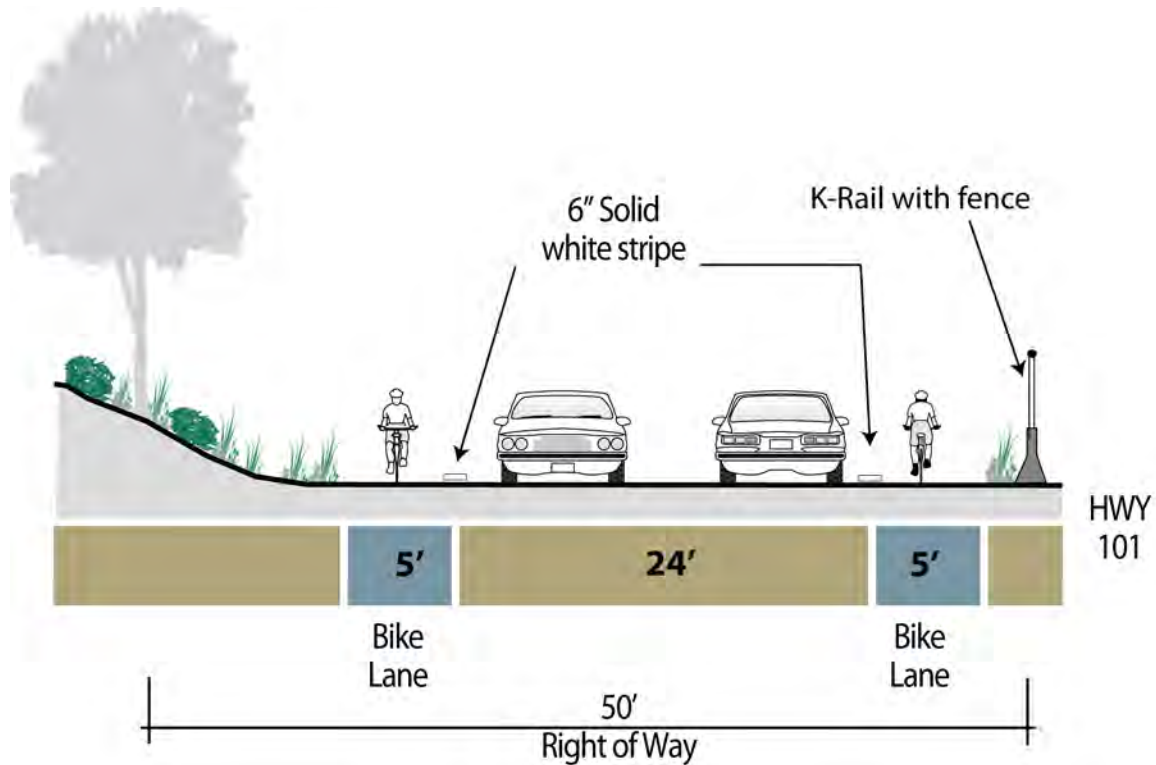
Proposed condition - section through southern portion of Casa Buena
